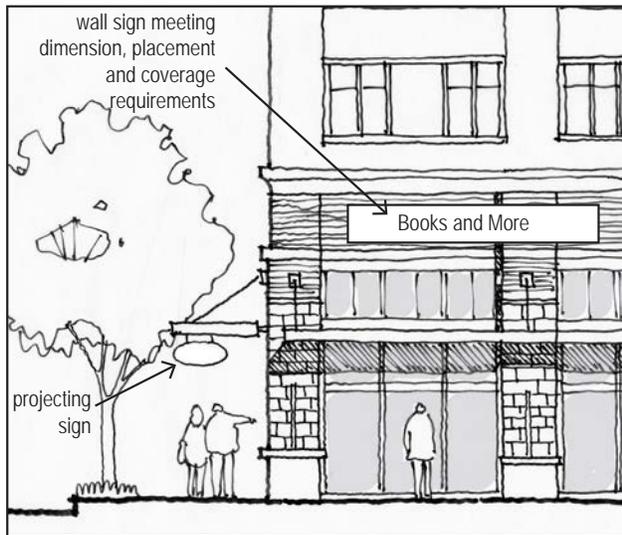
d.1 & 2: Ground-floor sign diagram
